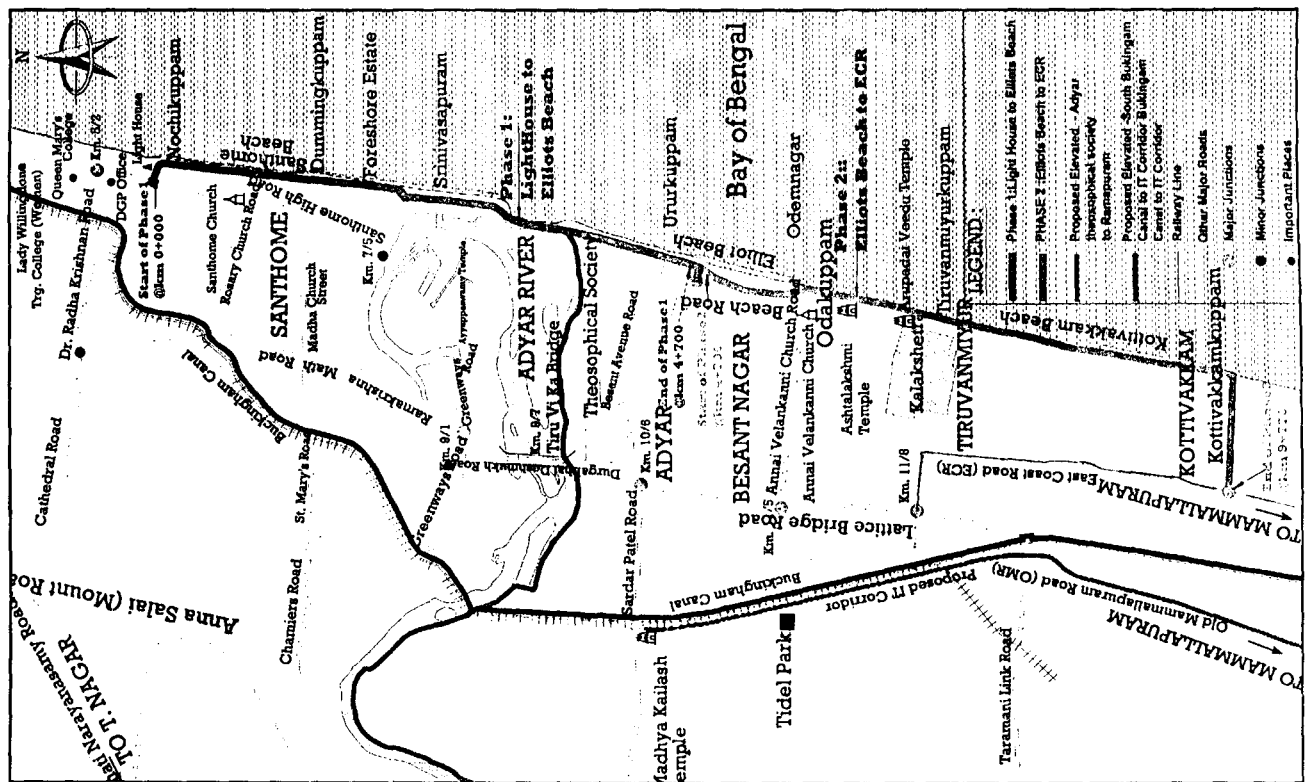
Phasing for Elevated Road between Light House and ECR
